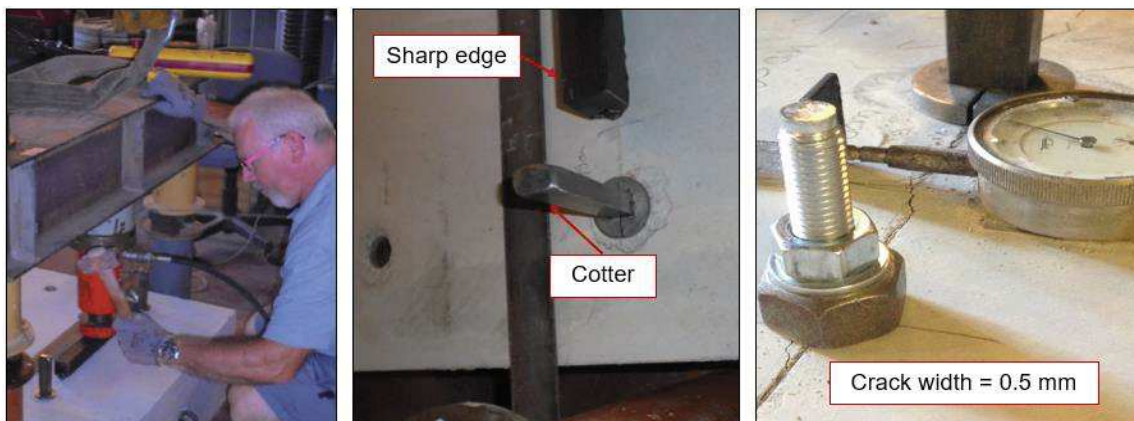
Testing protocol for opening the cracks in the concrete blocks.
